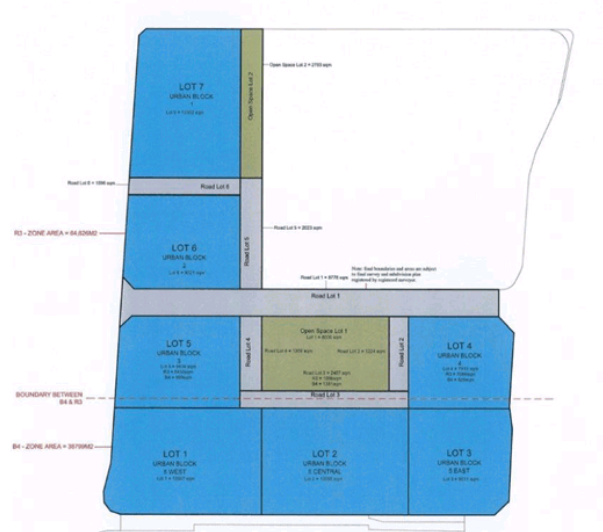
Approved Master Plan concept subdivision plan (DA-14/96)
